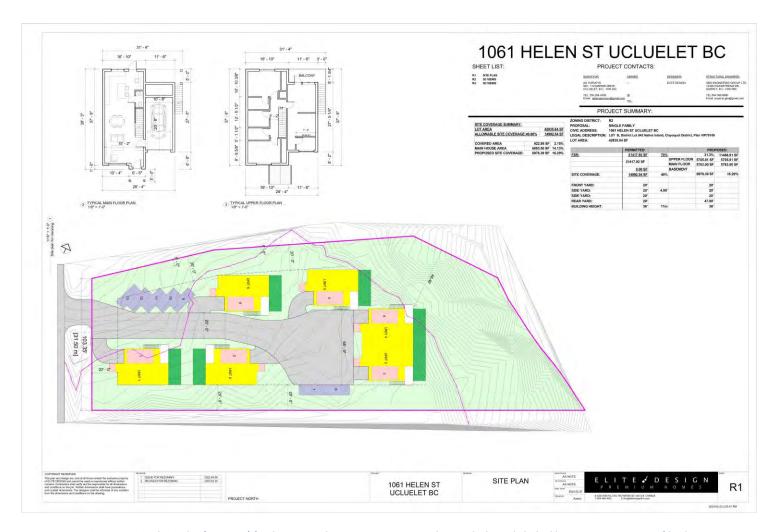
Revised site plan (Jan. 2024) for the proposed construction at 1061 Helen Road. The pink dashed line approximates top-of-bank.
